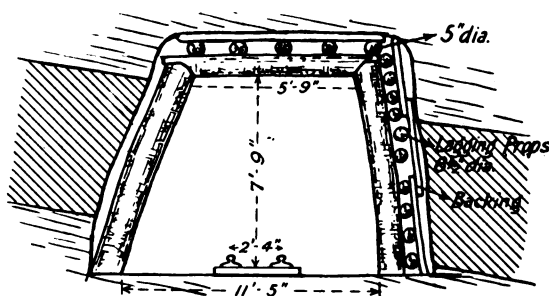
Manner of Timbering a Roadway in a Colliery in South Wales.
